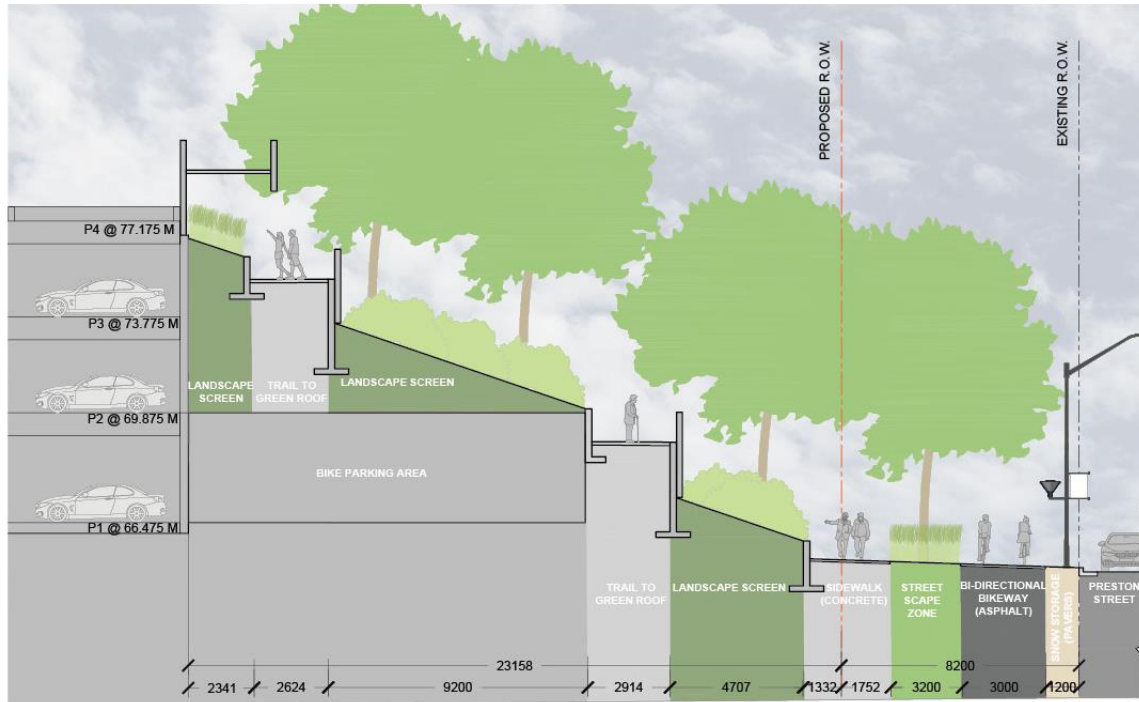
Master Site Plan - Public Realm Section Highlights Folding Landscape Along Preston Street
